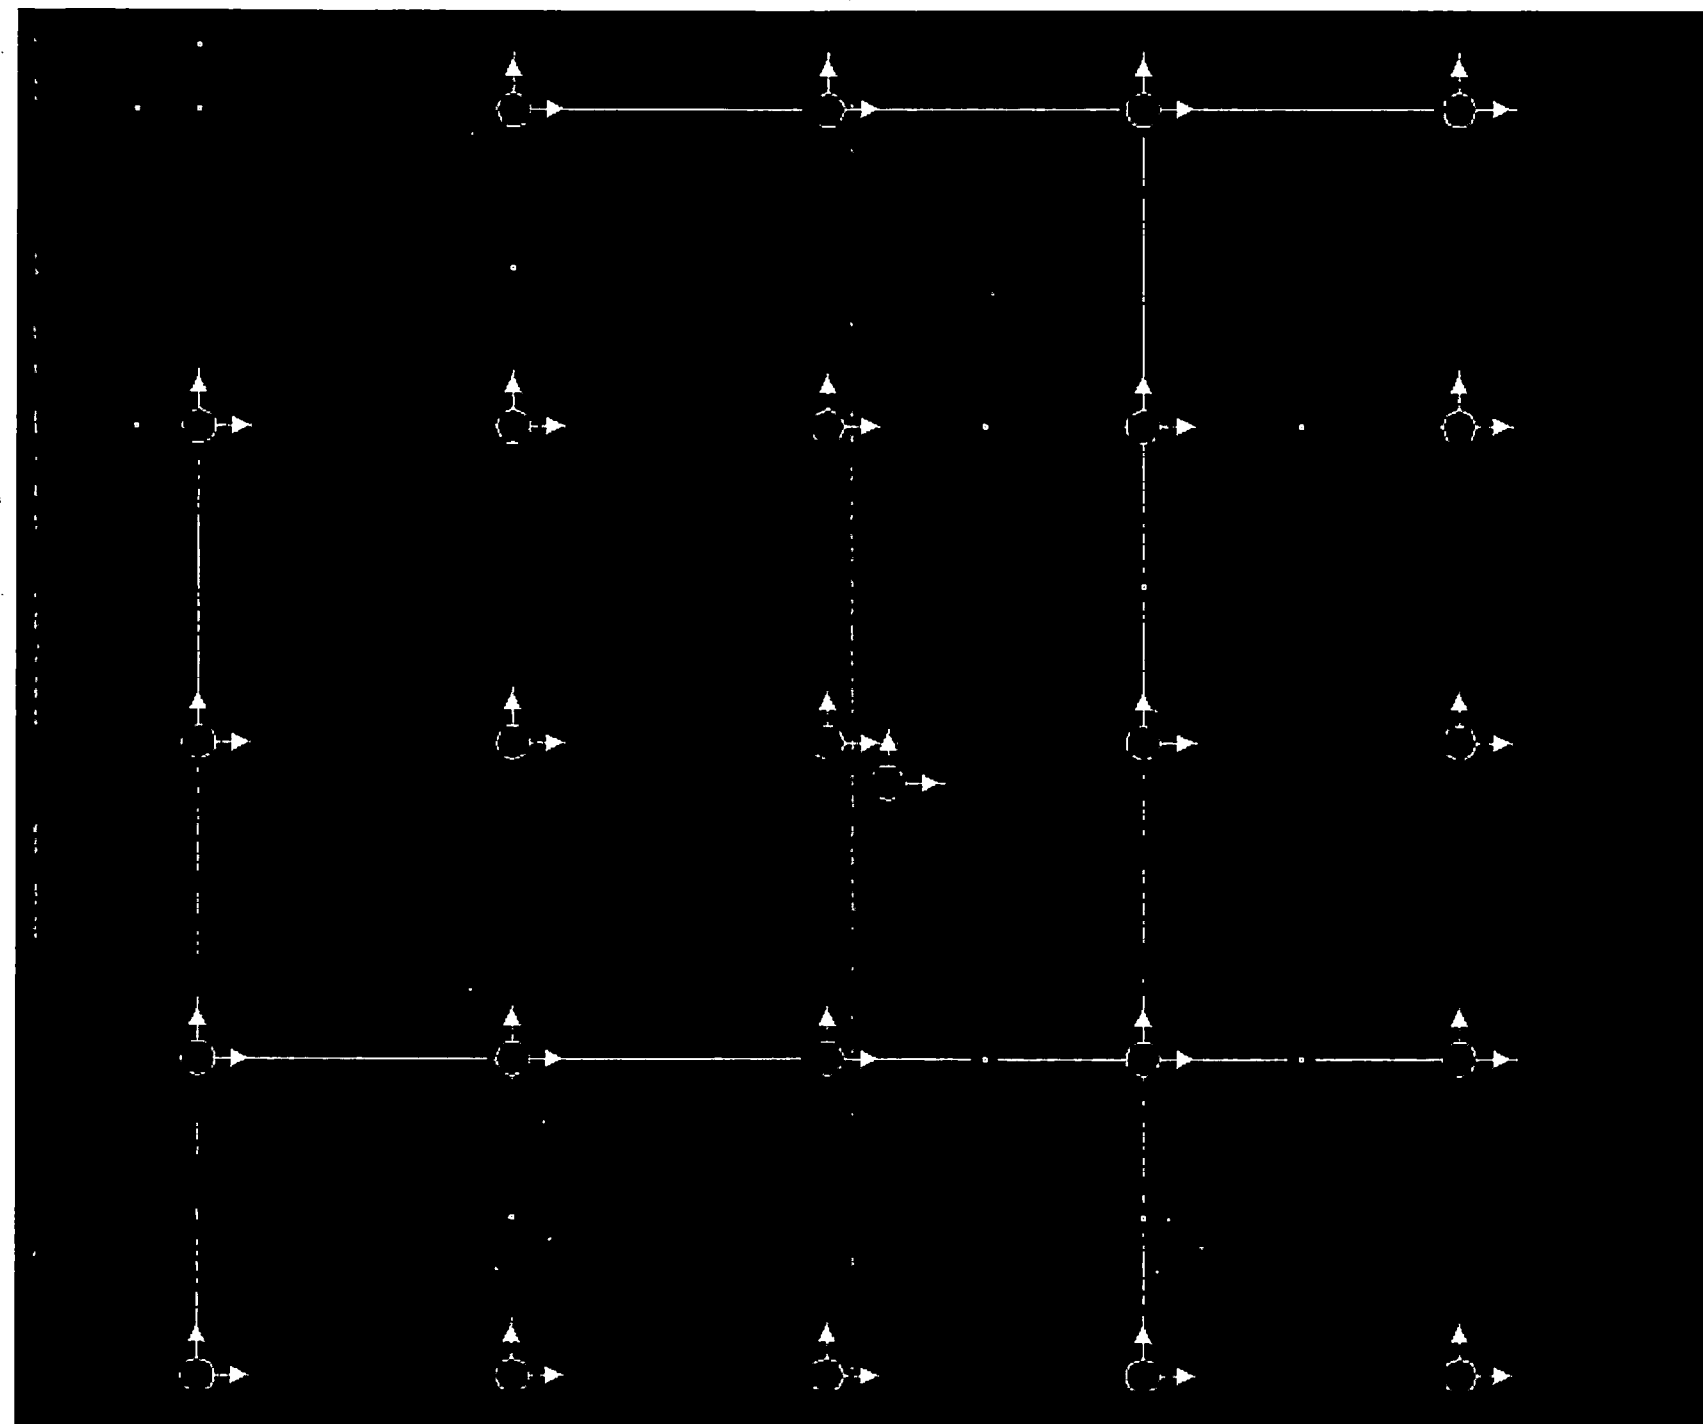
PERFORM-3D Model 2nd/3rd Floor Plan View, Diaphragm Definition (H1, H2, RV Constraints)
